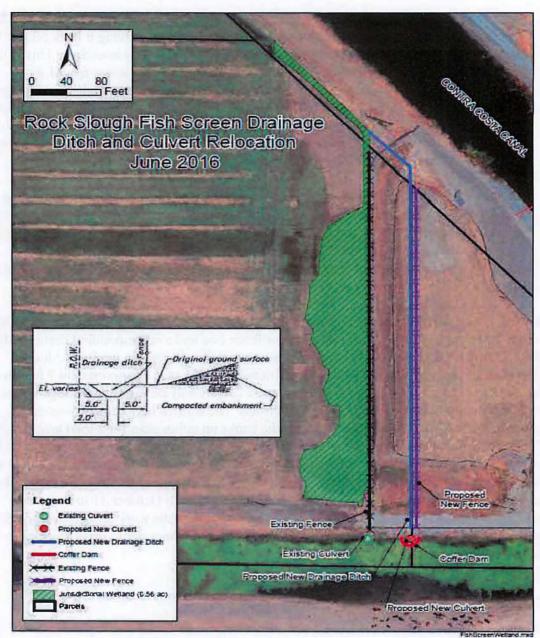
RSFS proposed drainage ditch and culvert relocation (Reclamation 2016).
